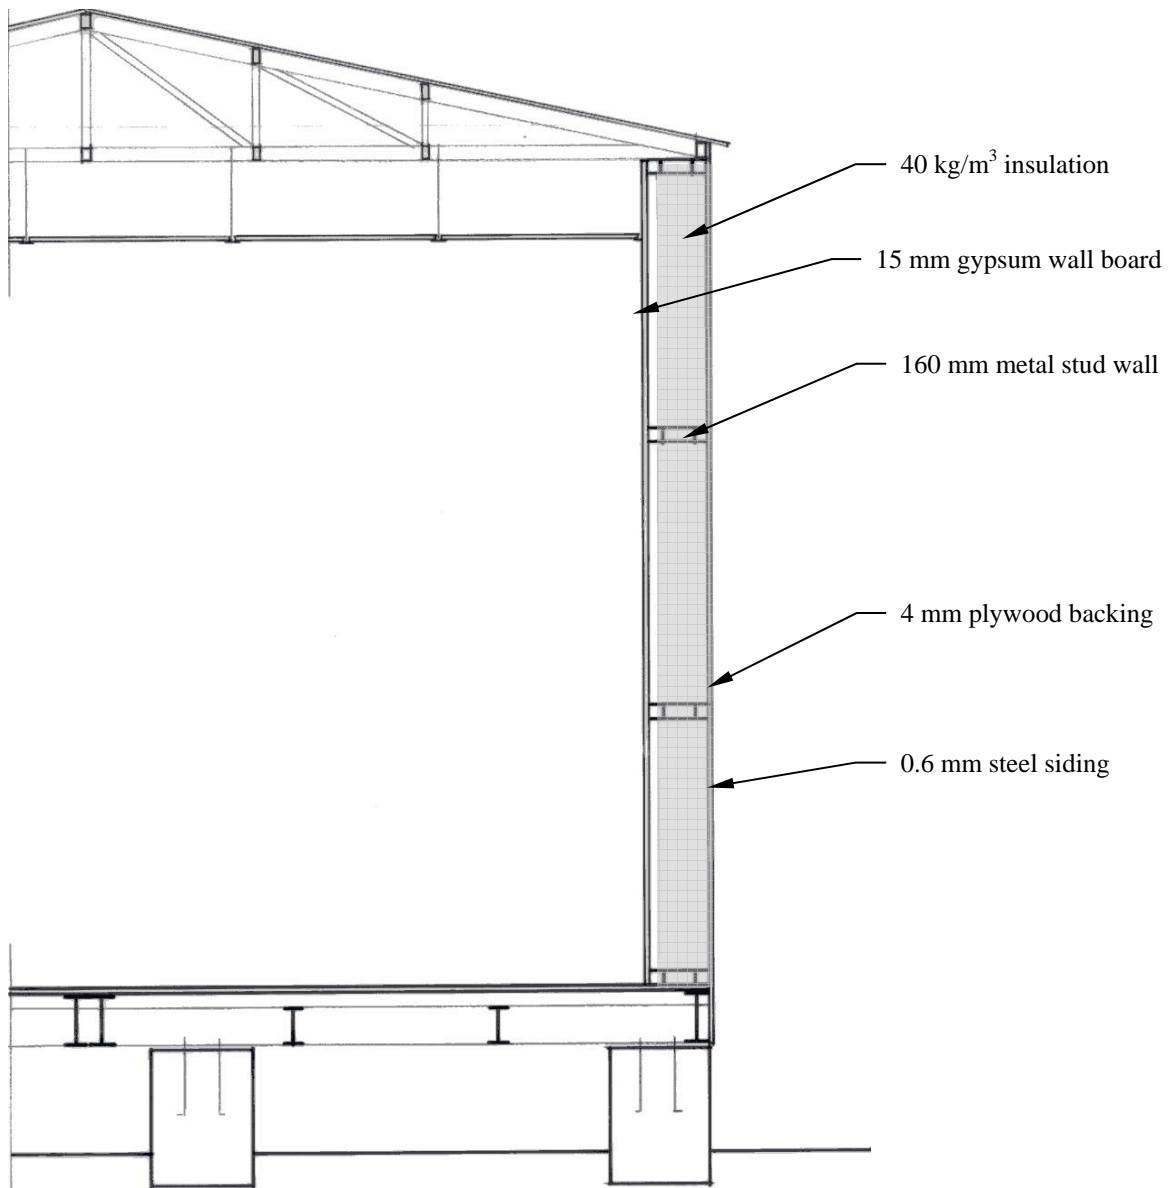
Prefabricated Metal Building Wall Section. The prefabricated metal building is a light construction and designed to be transportable.
